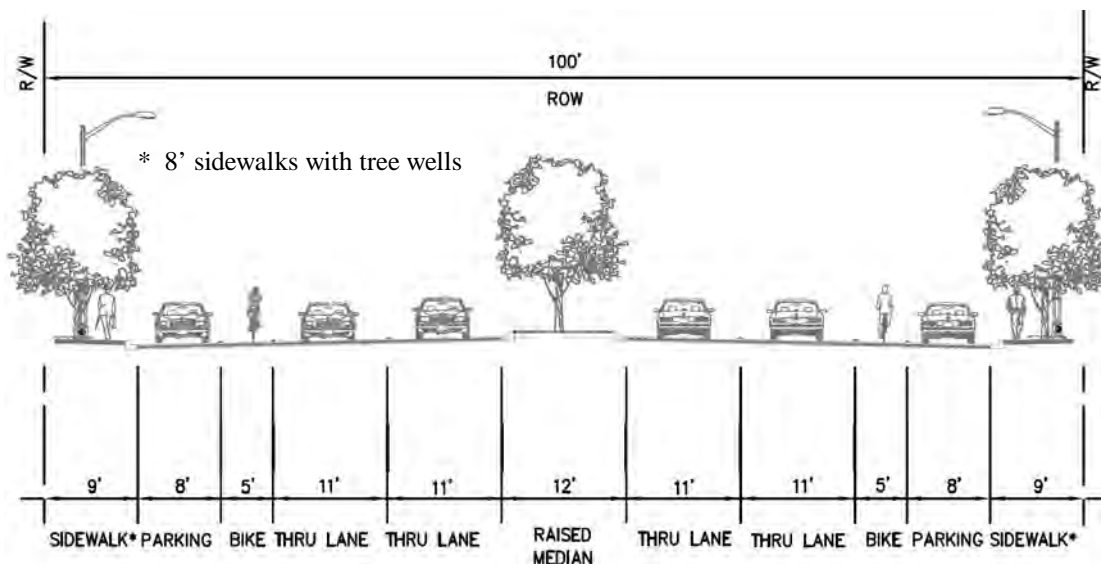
Proposed Cross Section, Broadway Between C Street and L Street
